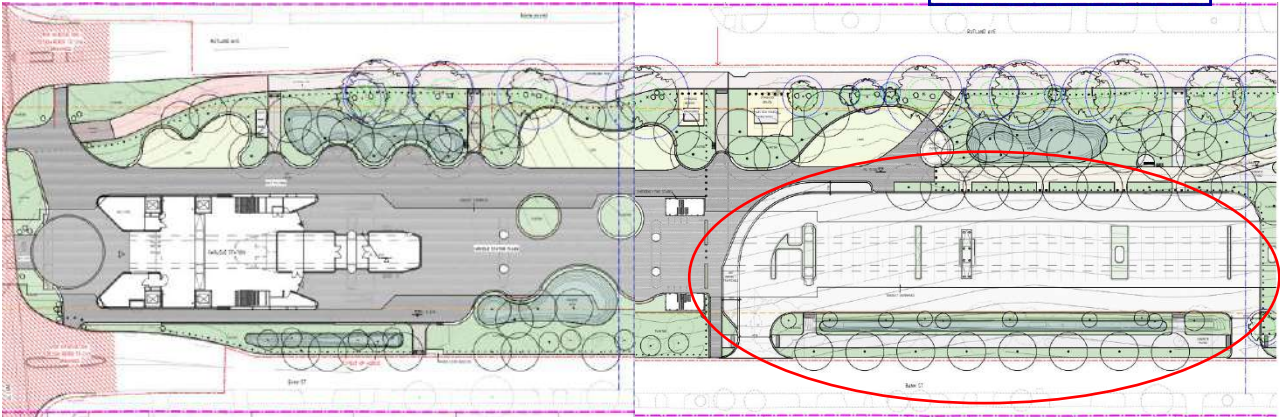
CARLISLE STATION CAR PARKING LAYOUT
